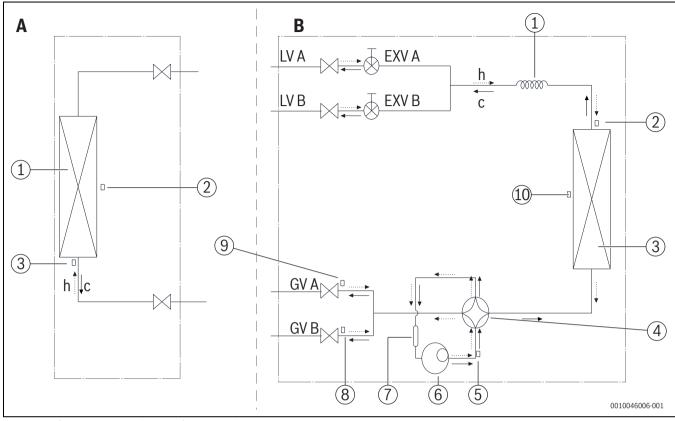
Refrigeration circuit drawing of inverter 1 drive 2 type
